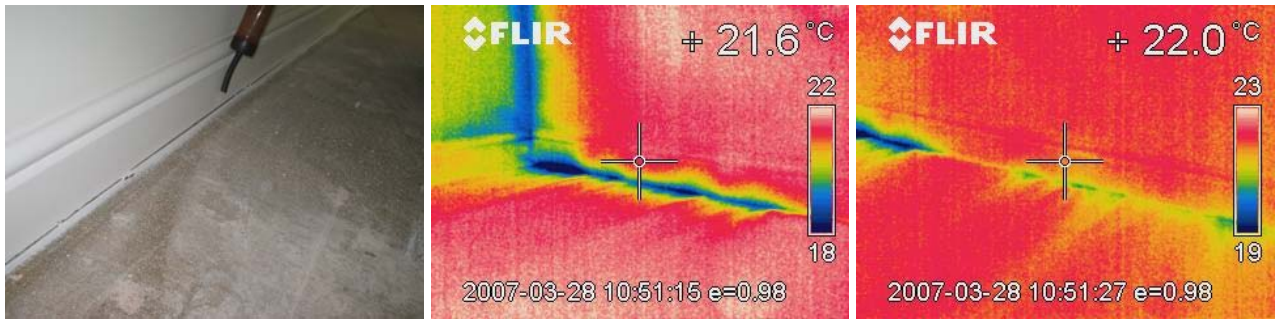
Air movement around failed sealant at the 2<sup>nd</sup> floor perimeter.
